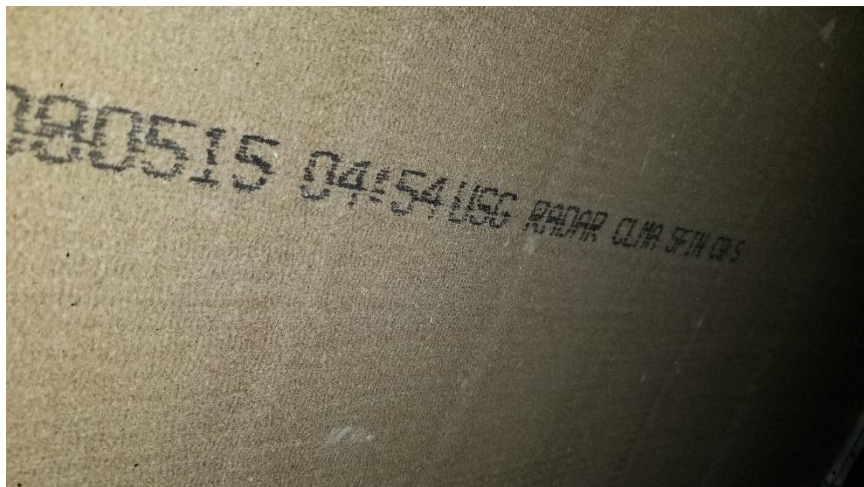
View of the ceiling tiles observed throughout the building with a 2015 date stamp.
